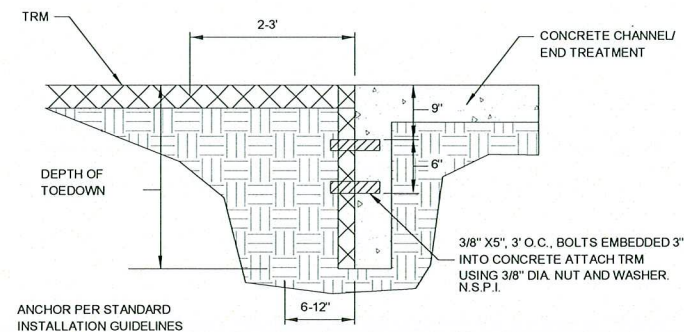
CONCRETE/TRM CONNECTION DETAIL
